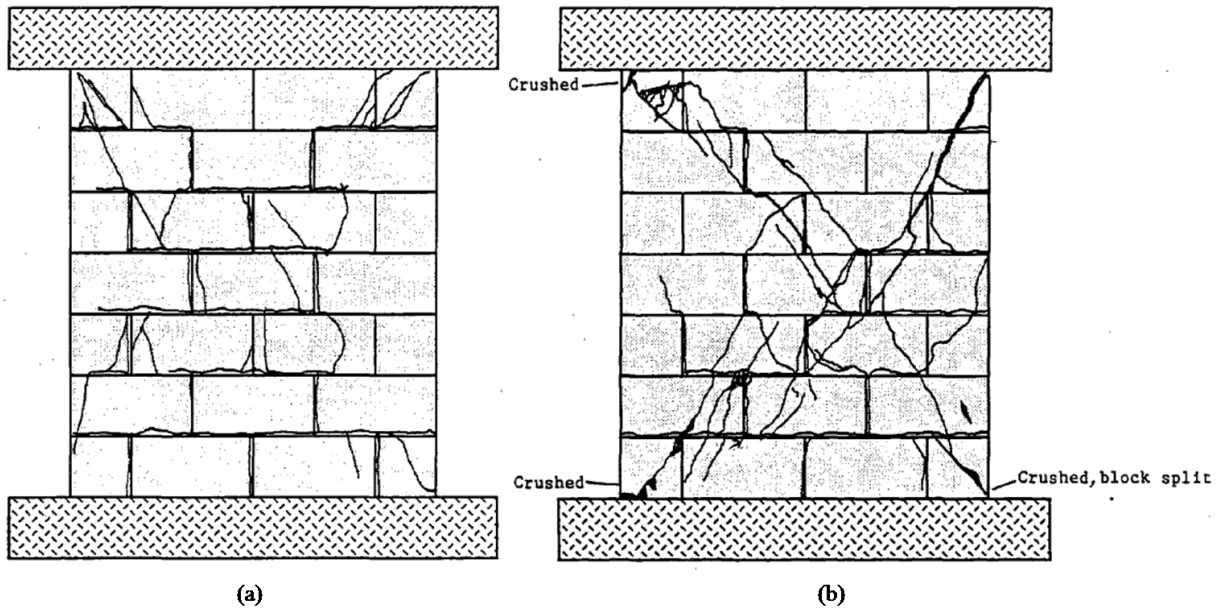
Cracking pattern for (a) wall reinforced with bed-joint reinforcement vs (b) wall reinforced with bond beam reinforcement (Yancey and Scribner 1989)
